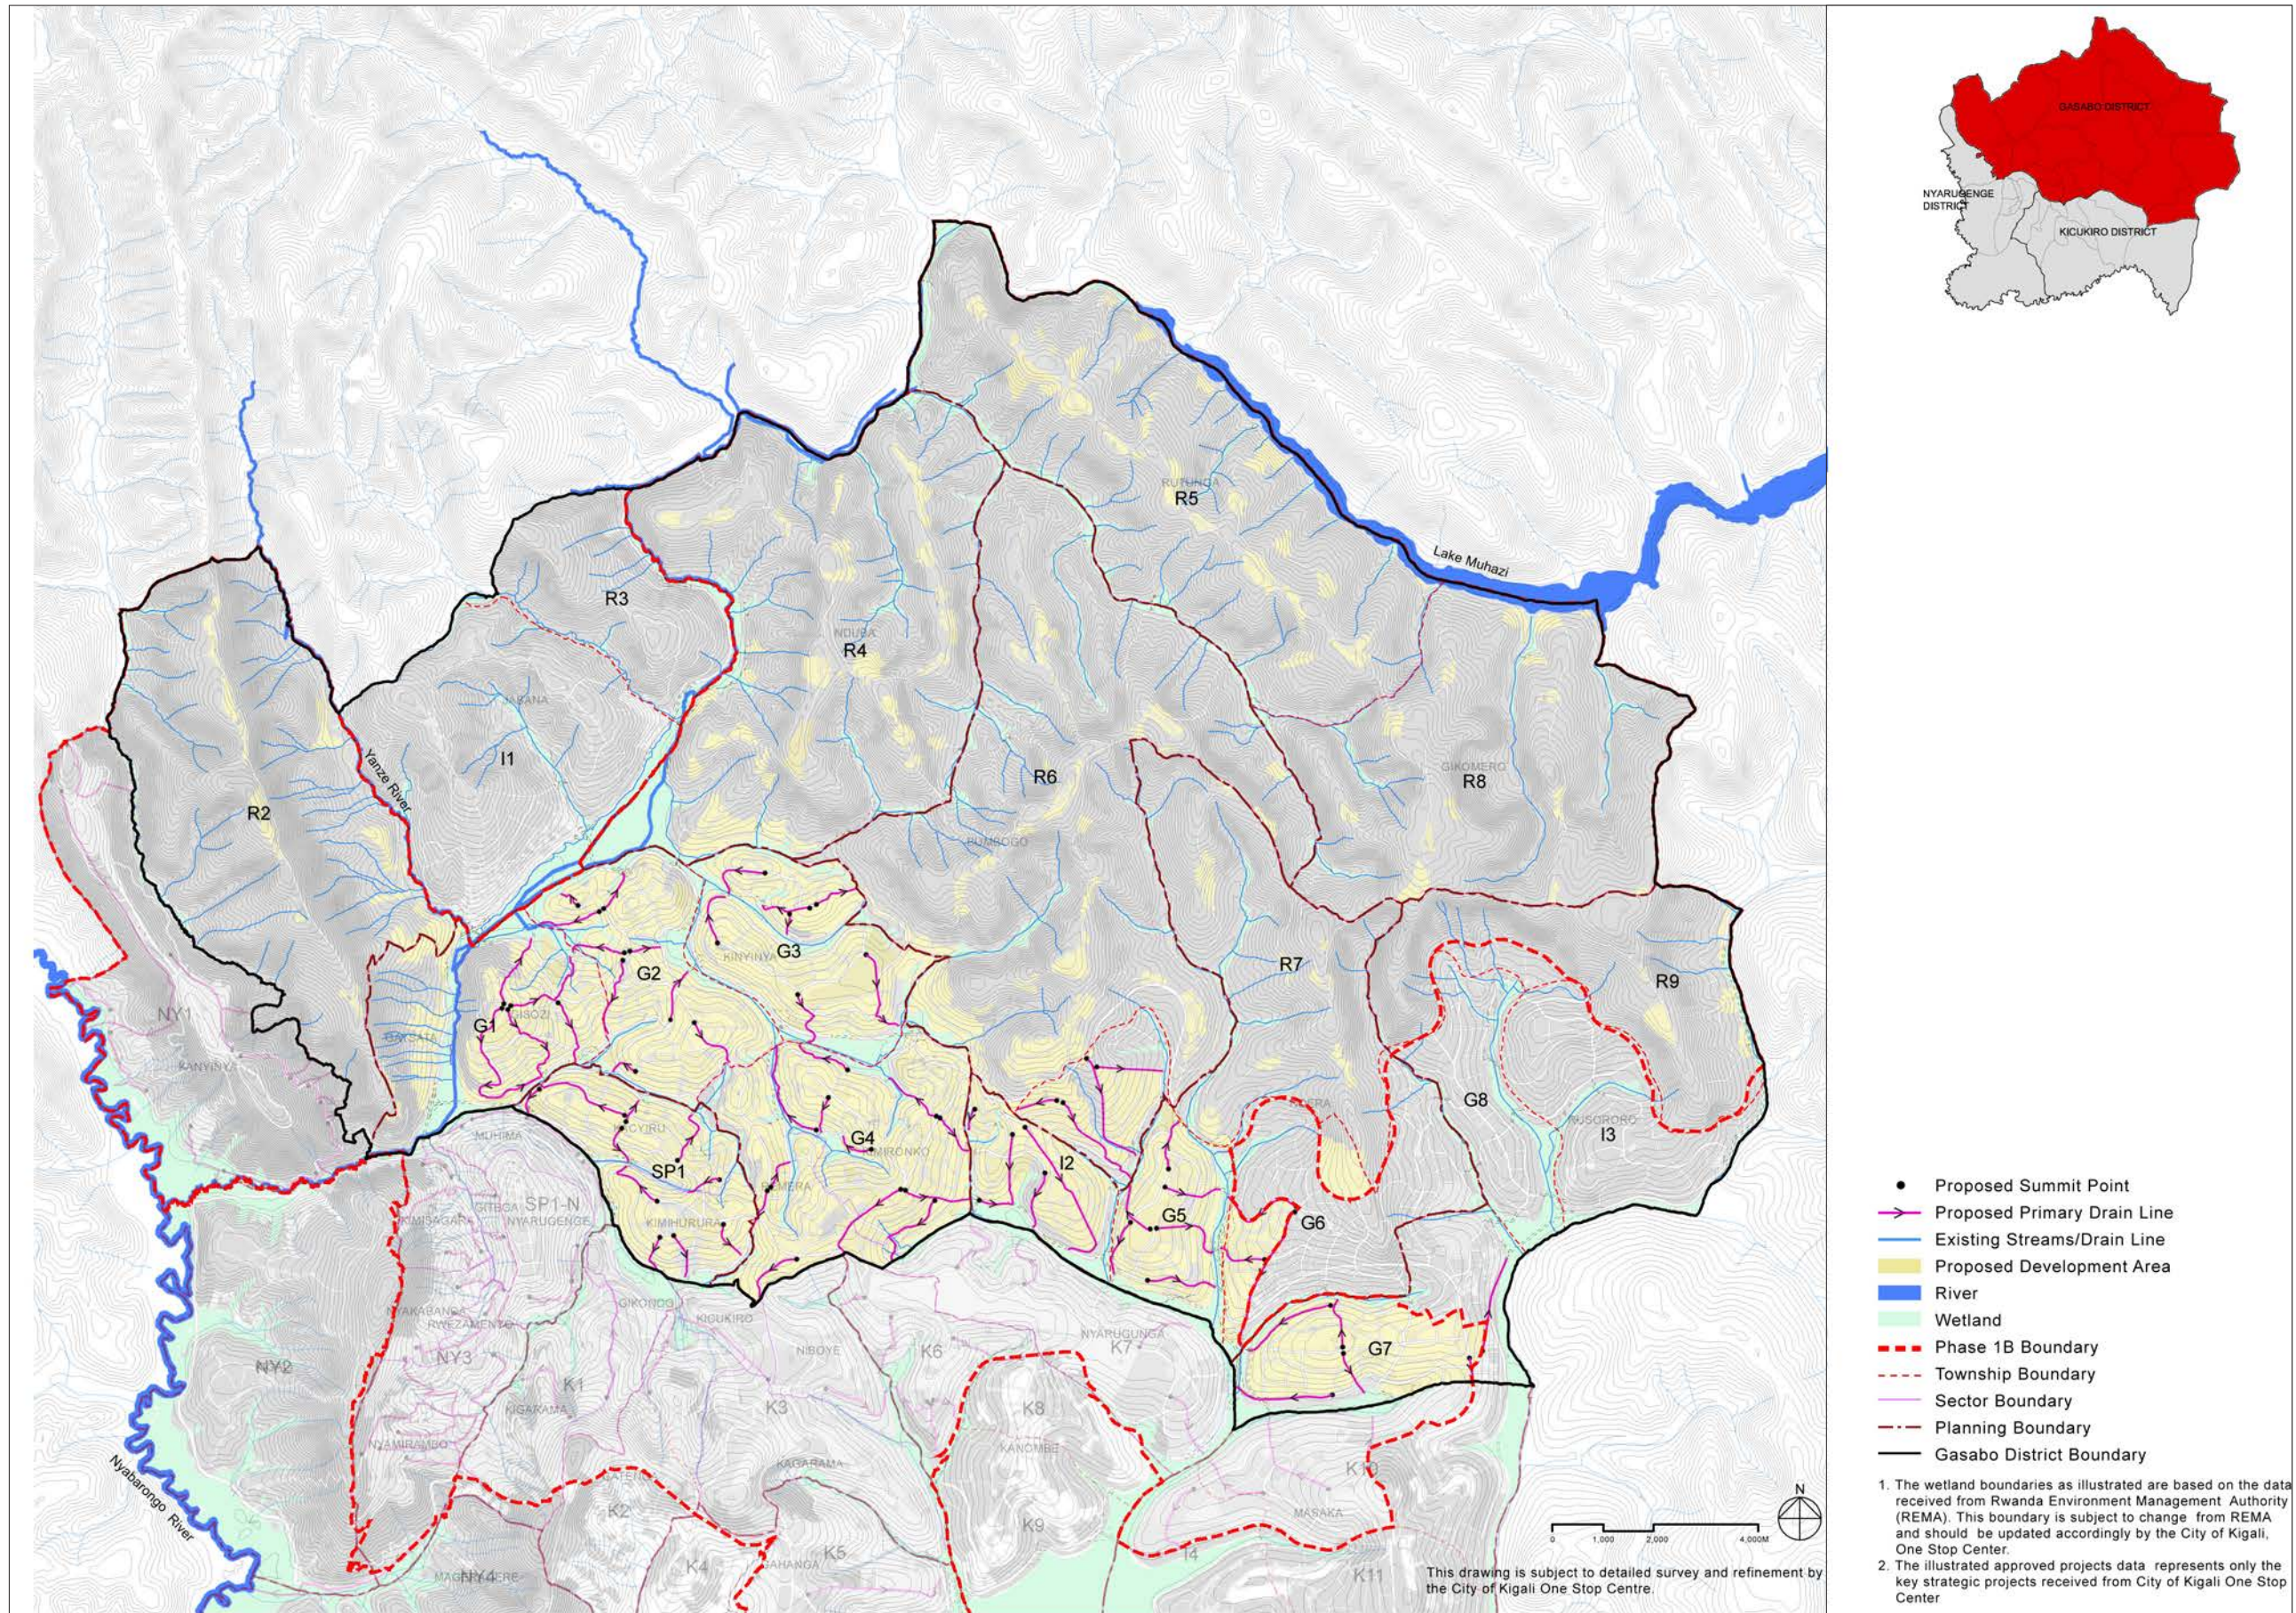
Gasabo District - Proposed Drainage Plan Year 2025
